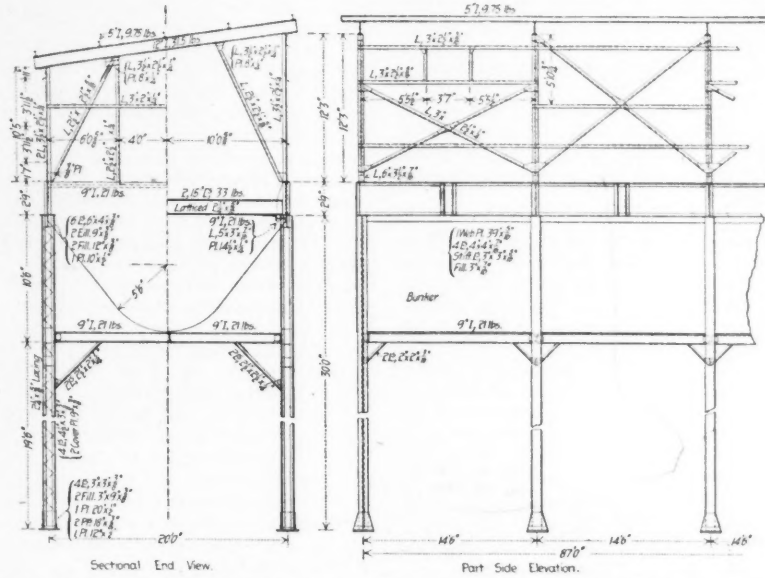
PART SIDE ELEVATION AND SECTIONAL END VIEW OF HANGING COAL BIN.
